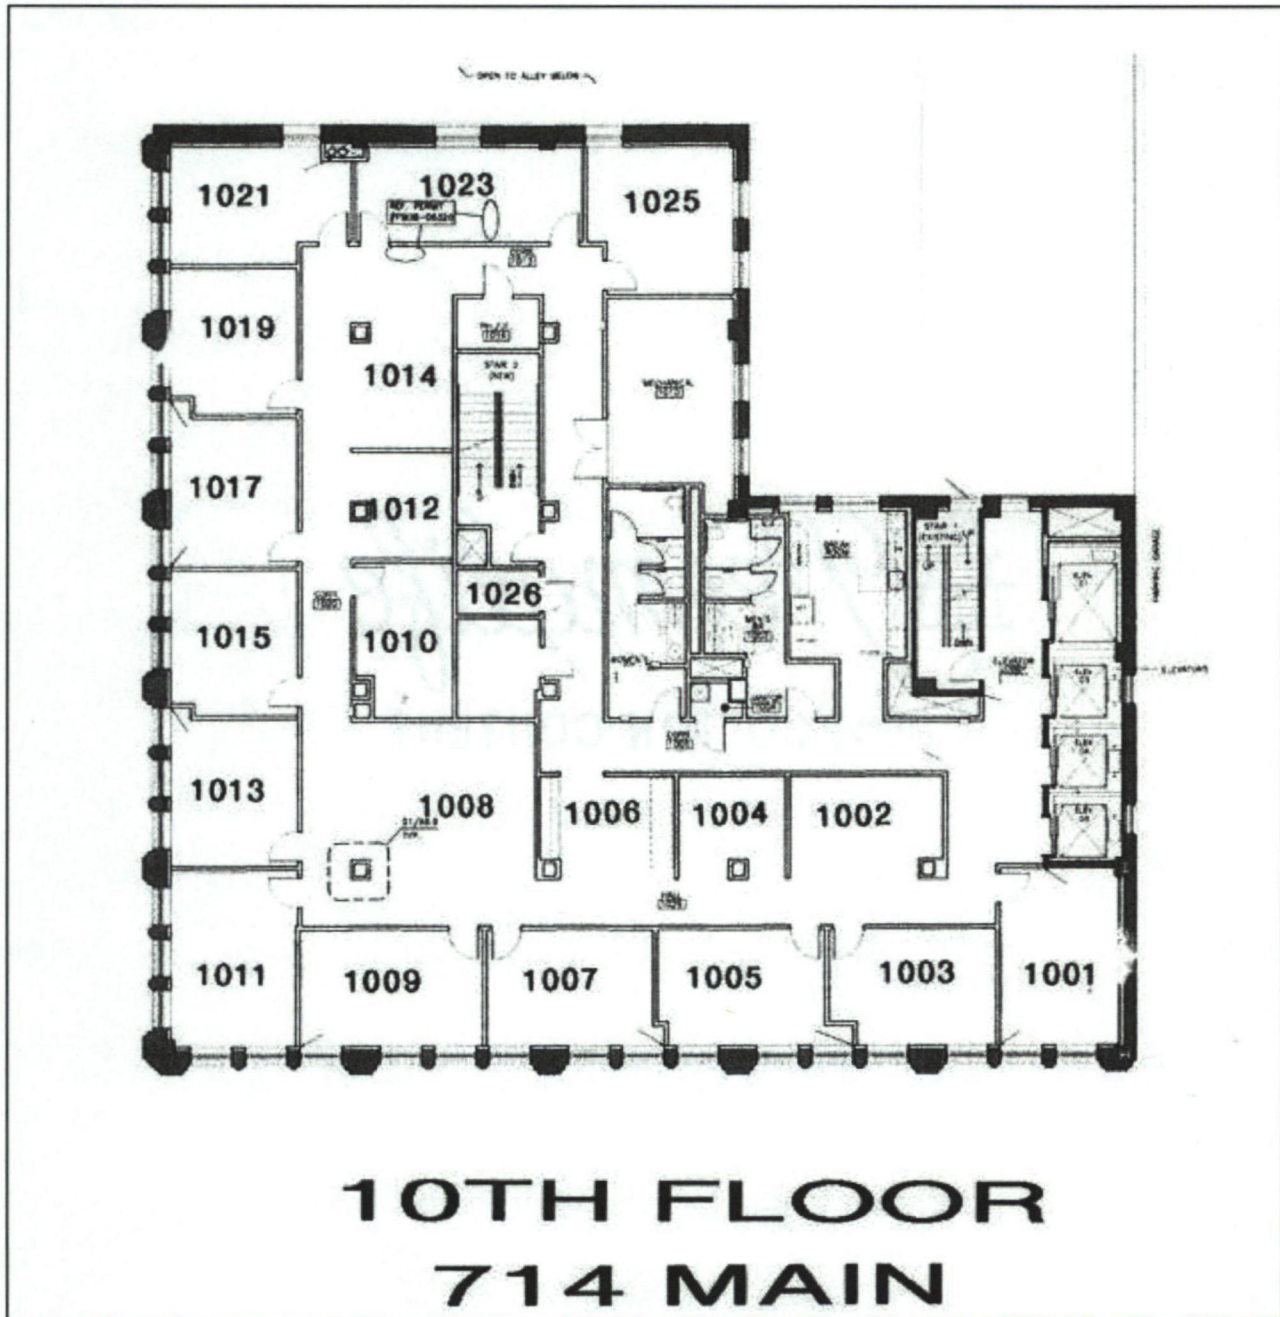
"10th Floor, typical floor plan for floors 5 through 24"
